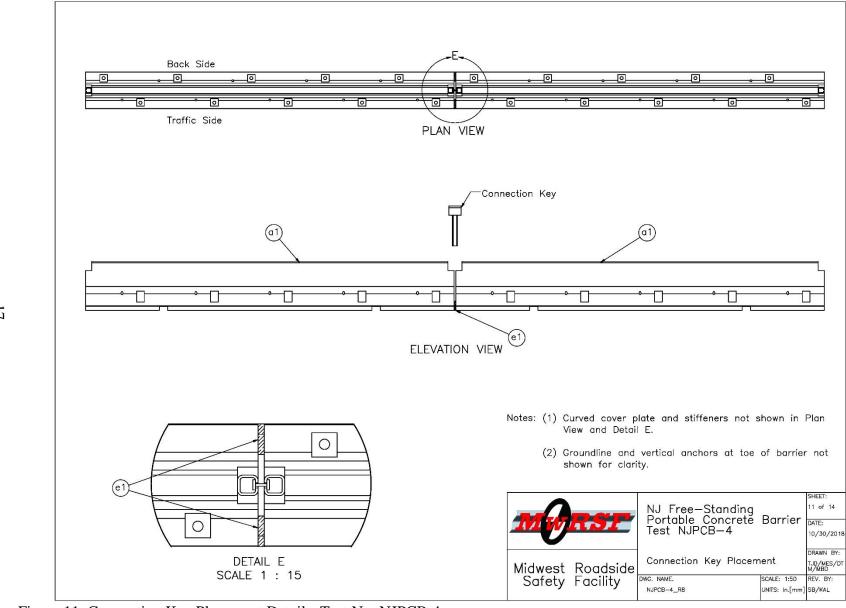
Connection Key Placement Details, Test No. NJPCB-4
